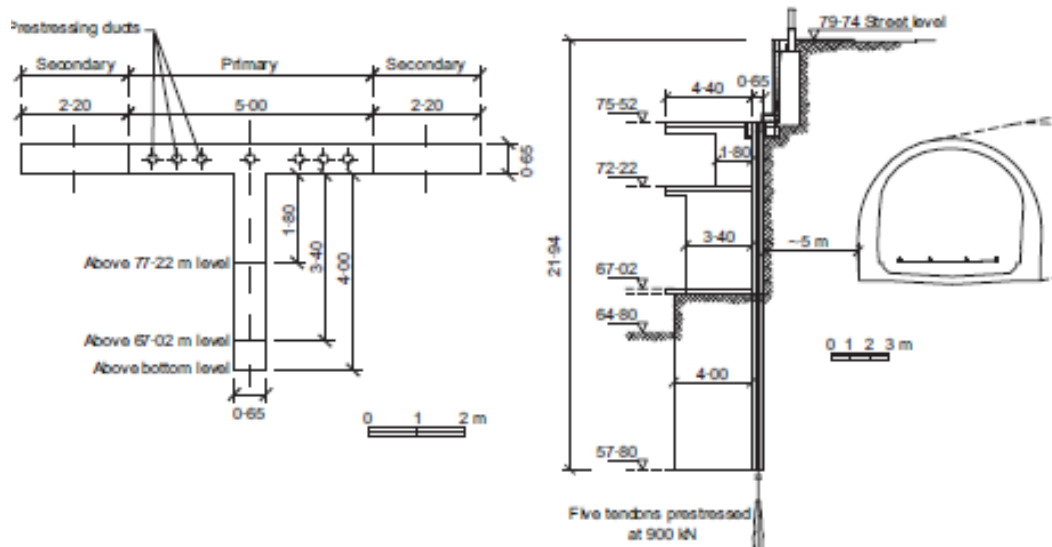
Cross section and vertical cut of the prestressed T-shaped diaphragm wall (Molins et al, 2006)
